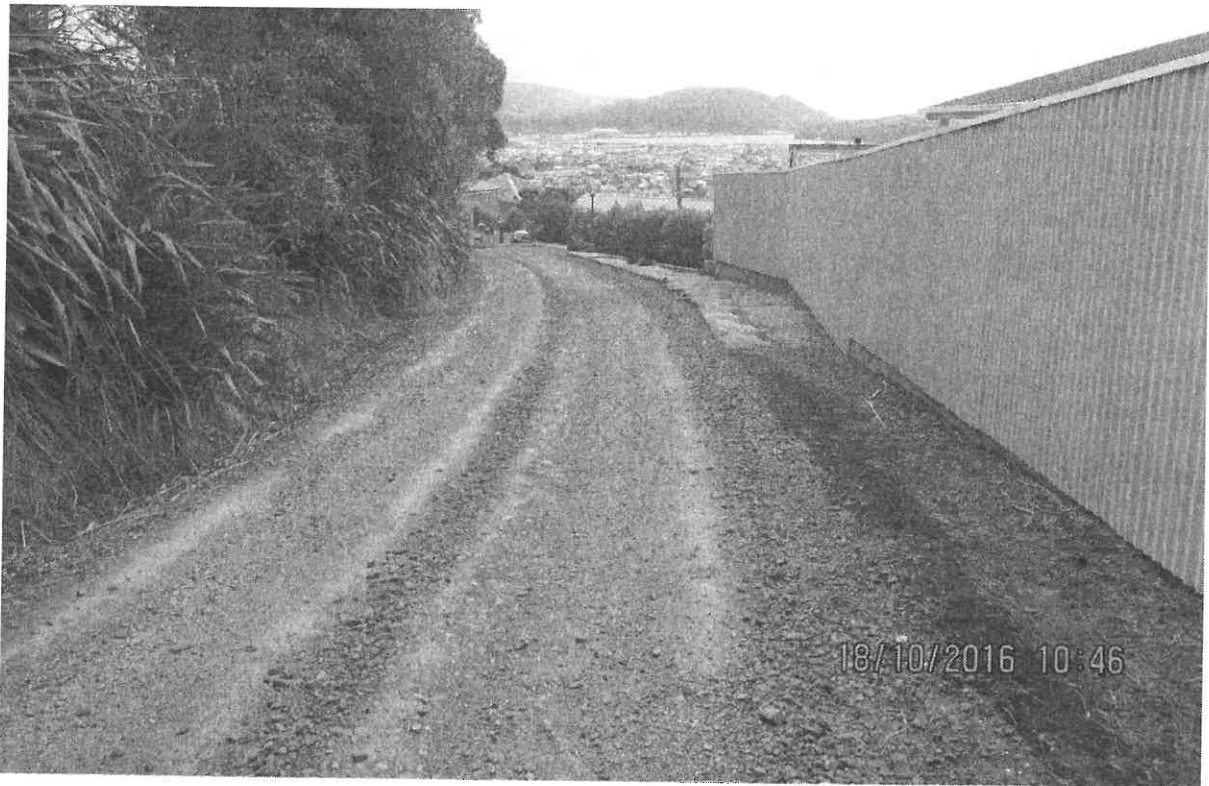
The lower section of Lyders Road with 107 Cliffs Road behind the fence.
